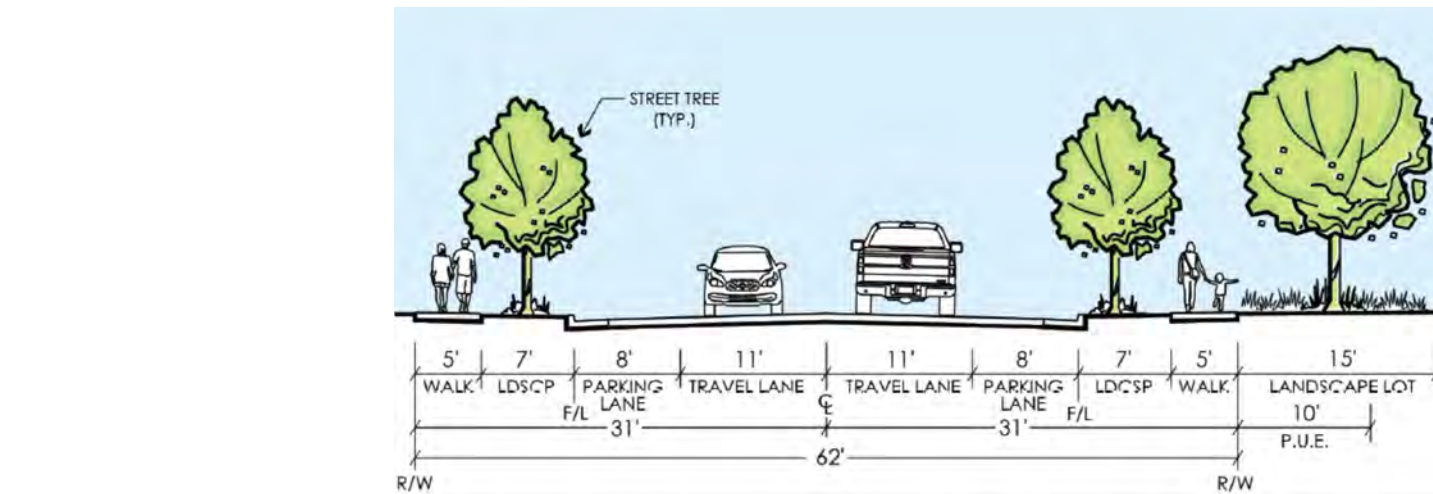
INTERIOR COLLECTOR ROAD (RESIDENTIAL FRONTAGE)
